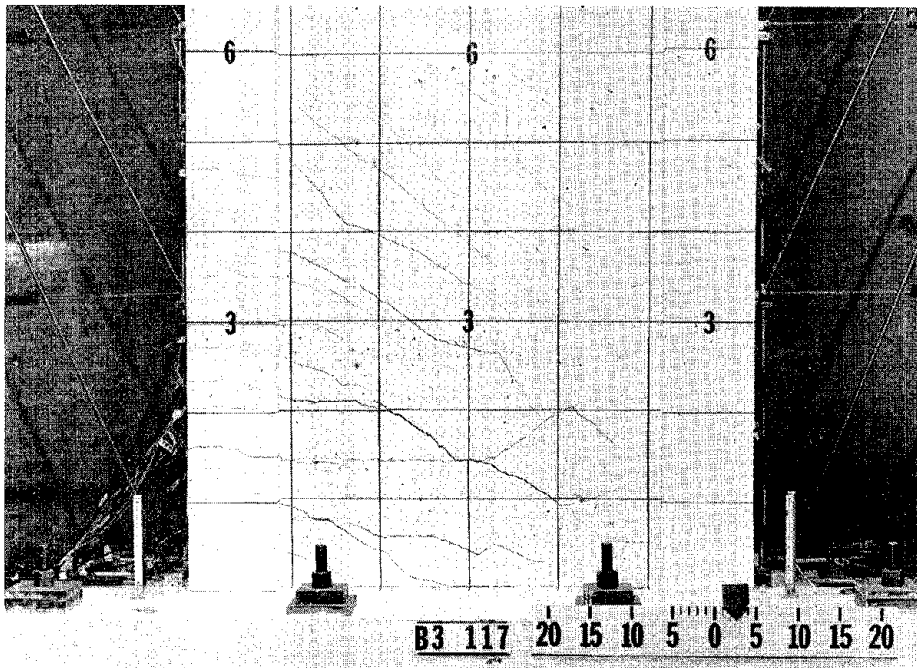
Specimen B3 With Top Deflection of +3 in.
